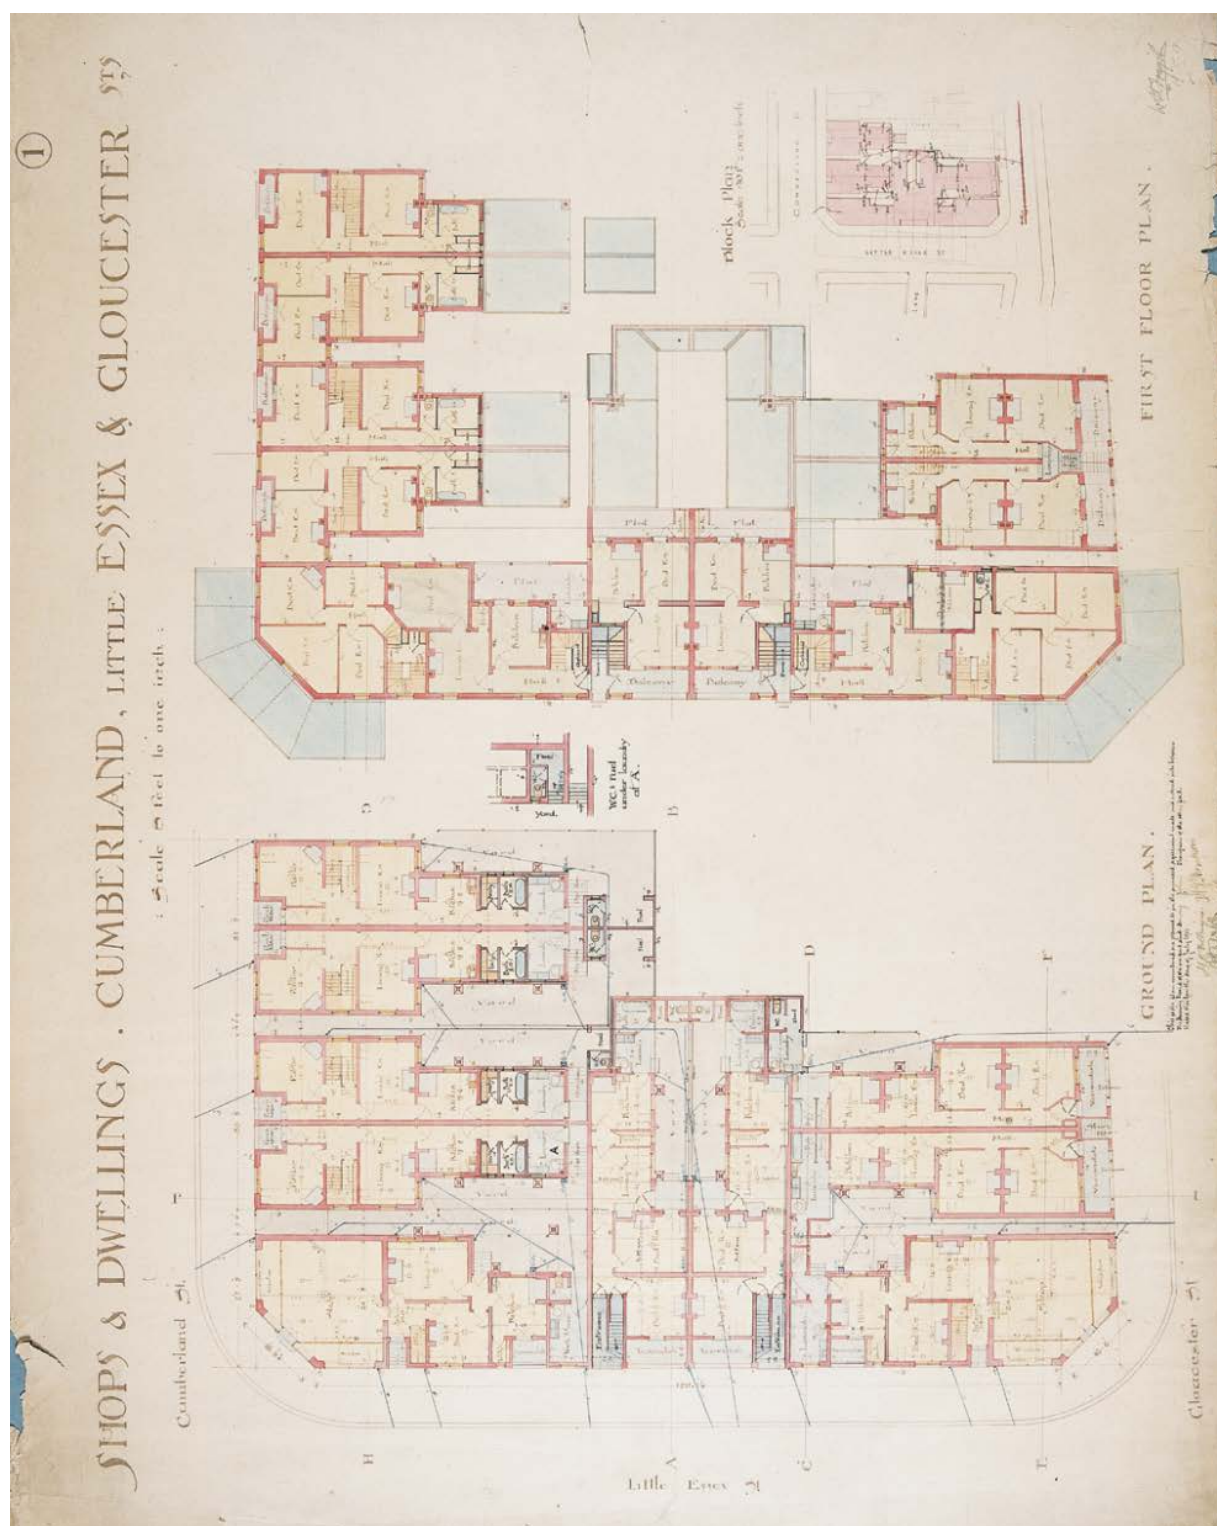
Ground and 1st floor plans for Shops & Dwellings, Cumberland, Little Essex & Gloucester Streets, The Rocks, Housing Board, Architect Foggitt dated May 1913. Source: State Records NSW, Plan No. 3132.
